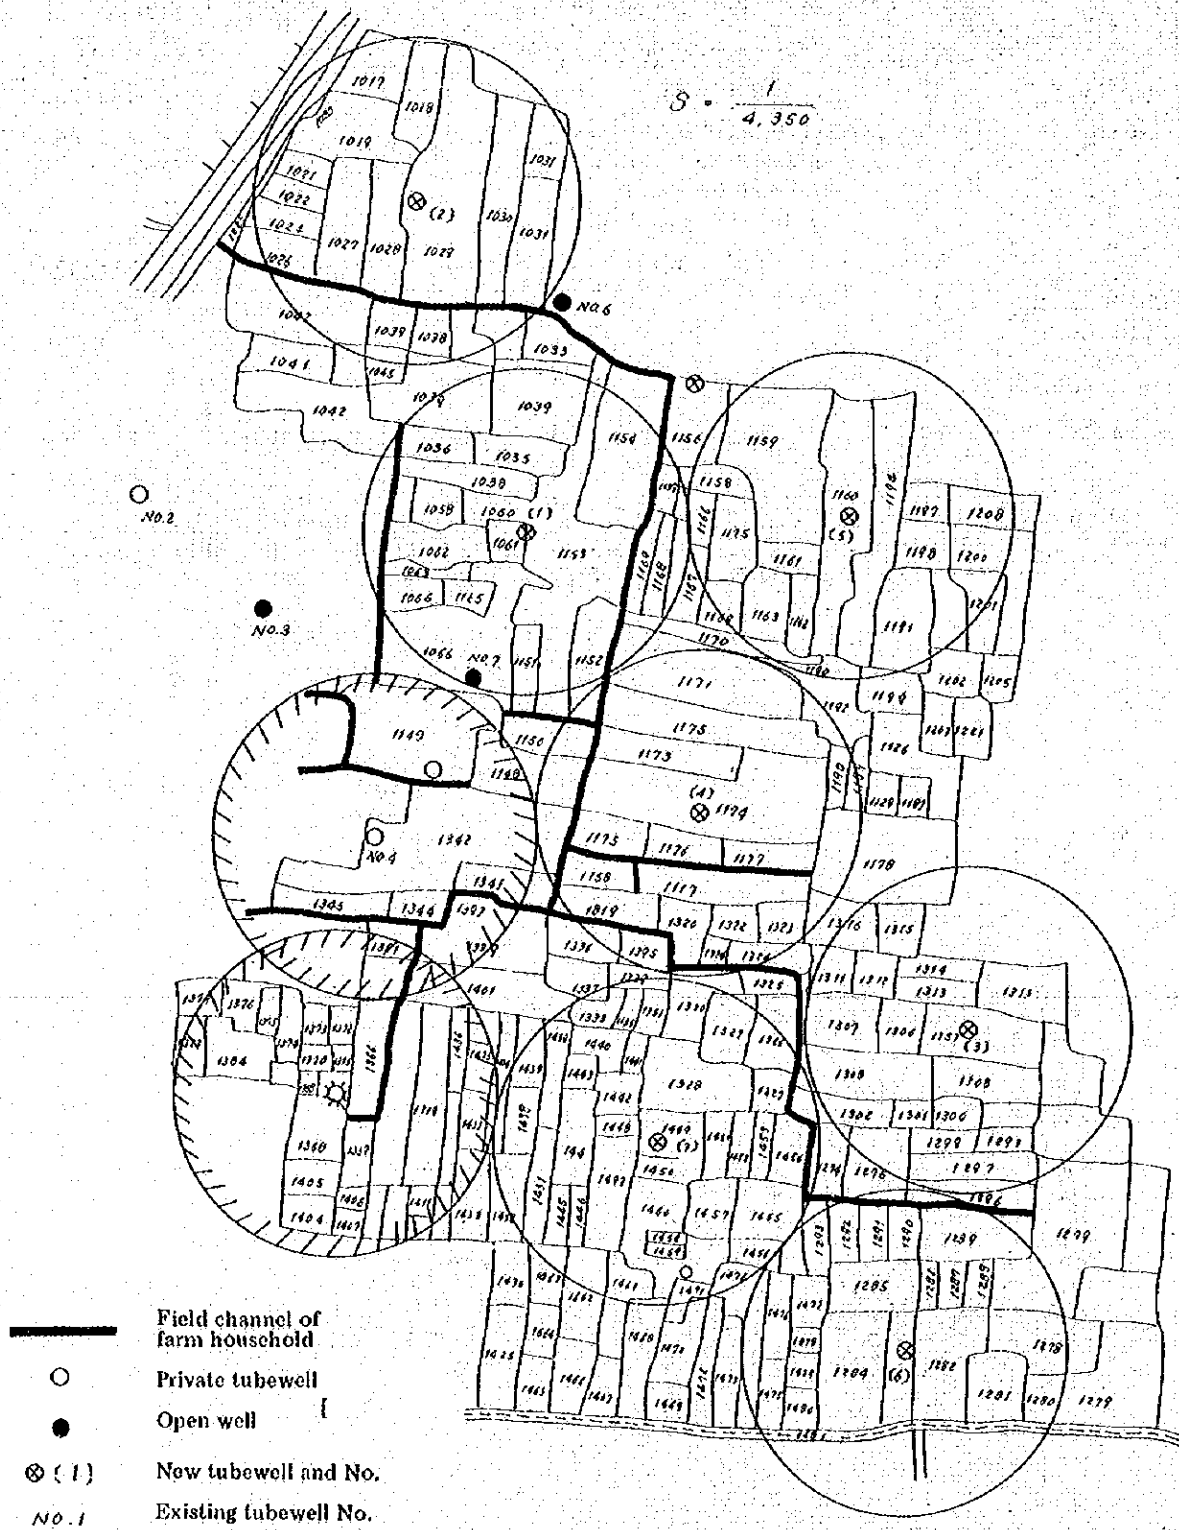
LOCATION PLAN OF NEW TUBEWELL (KATAR SUB-CENTER)
